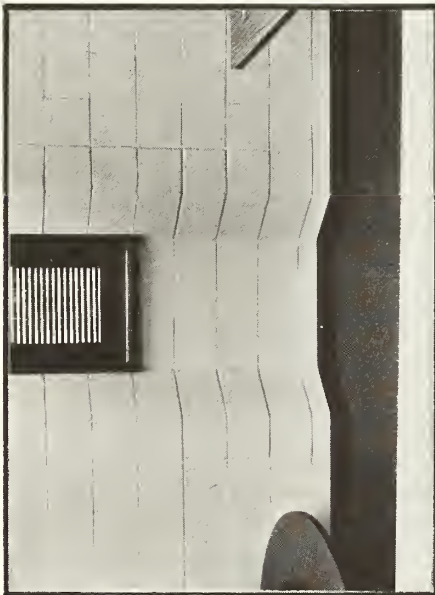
First floor east, interior wall of the Norris Cotton Federal Office Building
